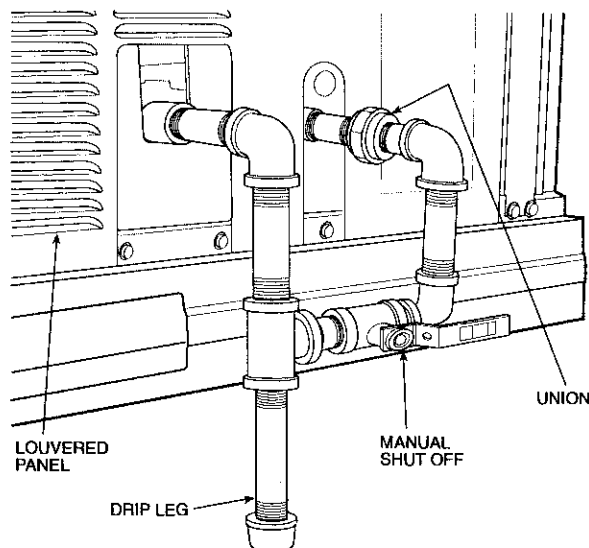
External Gas Piping with Thru-the-Bottom Connection (3 to 6 Ton Models Shown)
